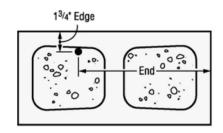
EDGE AND END DISTANCES FOR THE CARBON STEEL TITEN HD ANCHOR INSTALLED IN THE TOP OF GROUT-FILLED CMU MANSORY WALL CONSTRUCTION (Refer to Table 4)
